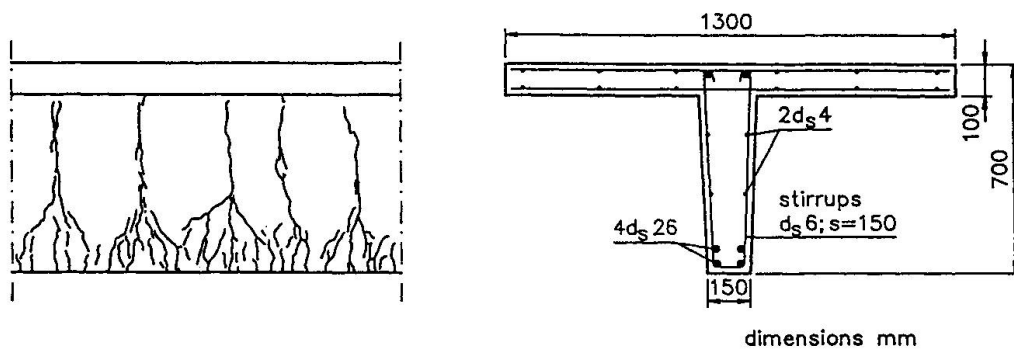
Crack pattern and cross-section of a deep T-beam [5].
